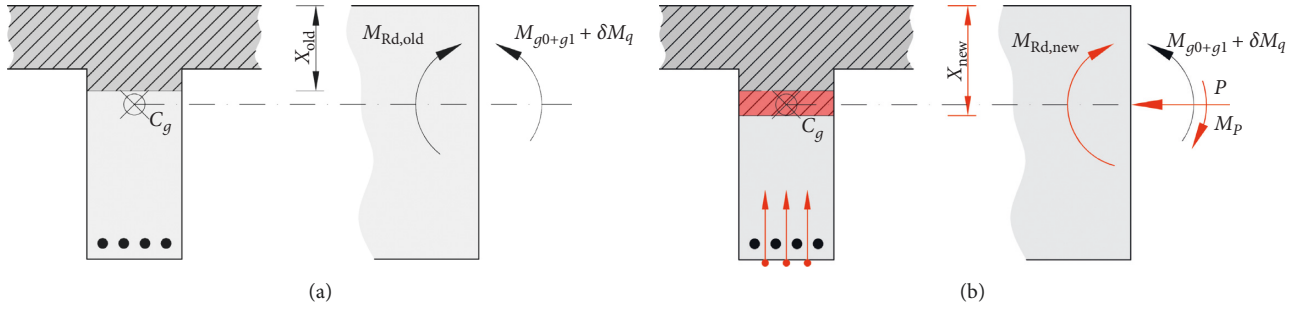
Expression of the prestressing effect on the beam structure cross section. The beam cross section and its internal forces (pure bending) (a) before and (b) after application of prestressing force. The cross section is now eccentrically in compression (a combination of bending moments and axial force), thus increasing the load-bearing capacity of the cross section.
